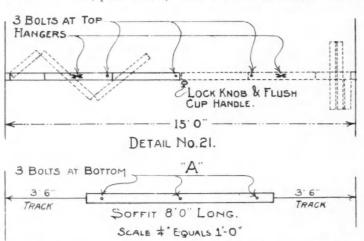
Detail A shows that two pieces of 3½-foot track are needed. Track is not required full width of opening.
